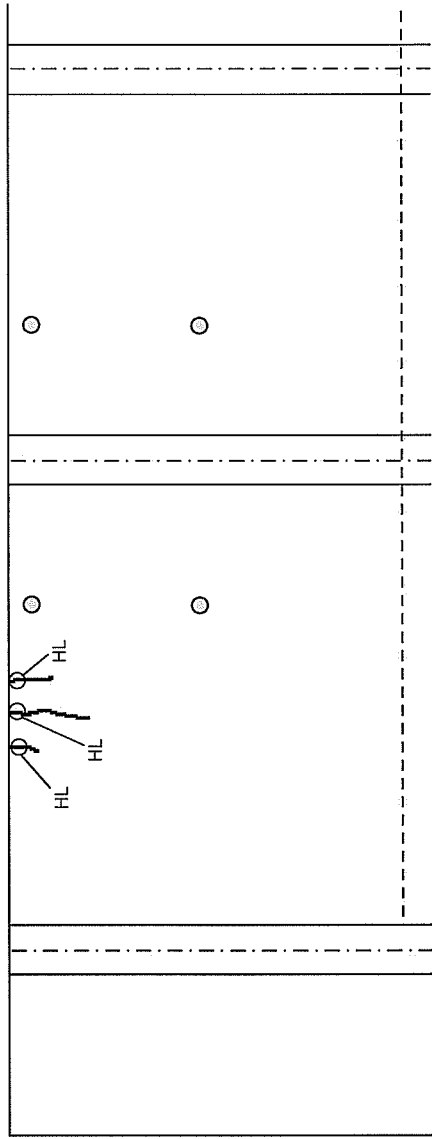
Crack map, SEJ, 6 in. top reinforcement spacing, negative-moment region, bottom view of slab,
